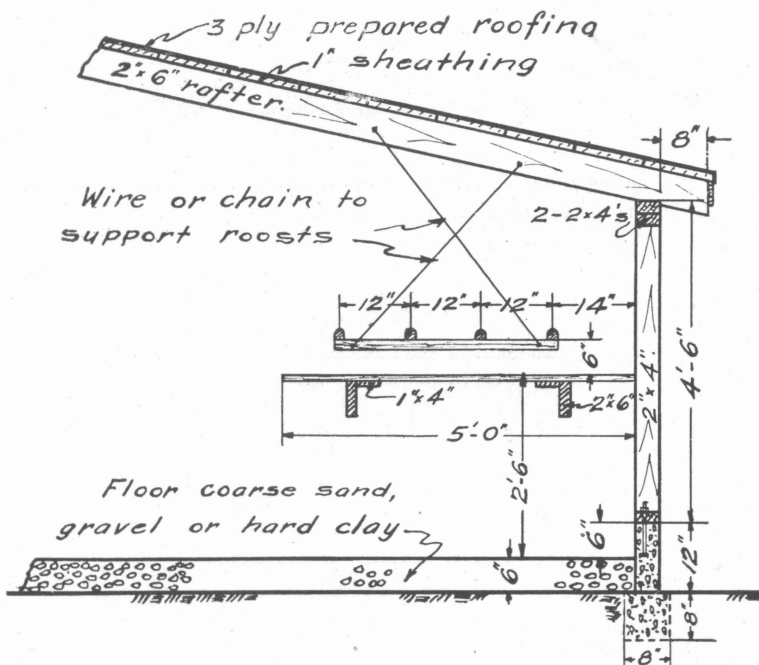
Detail of roosts suspended by wires and removable dropping board.
